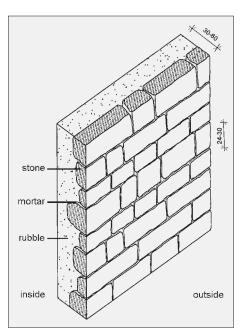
AXONOMETRIC PREVIEW: A WALL WITH EXTERIOR STONE CLADDING
